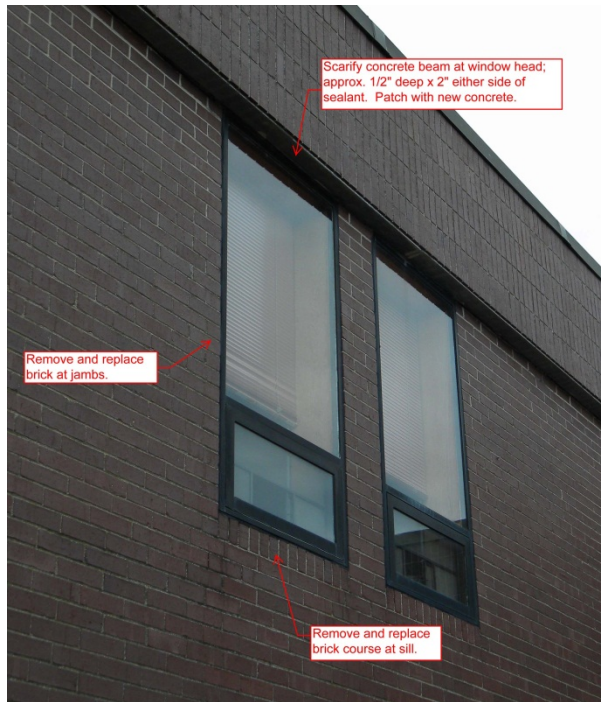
Existing brick jambs and sill and concrete head at typical Type 'A/A1' windows.
